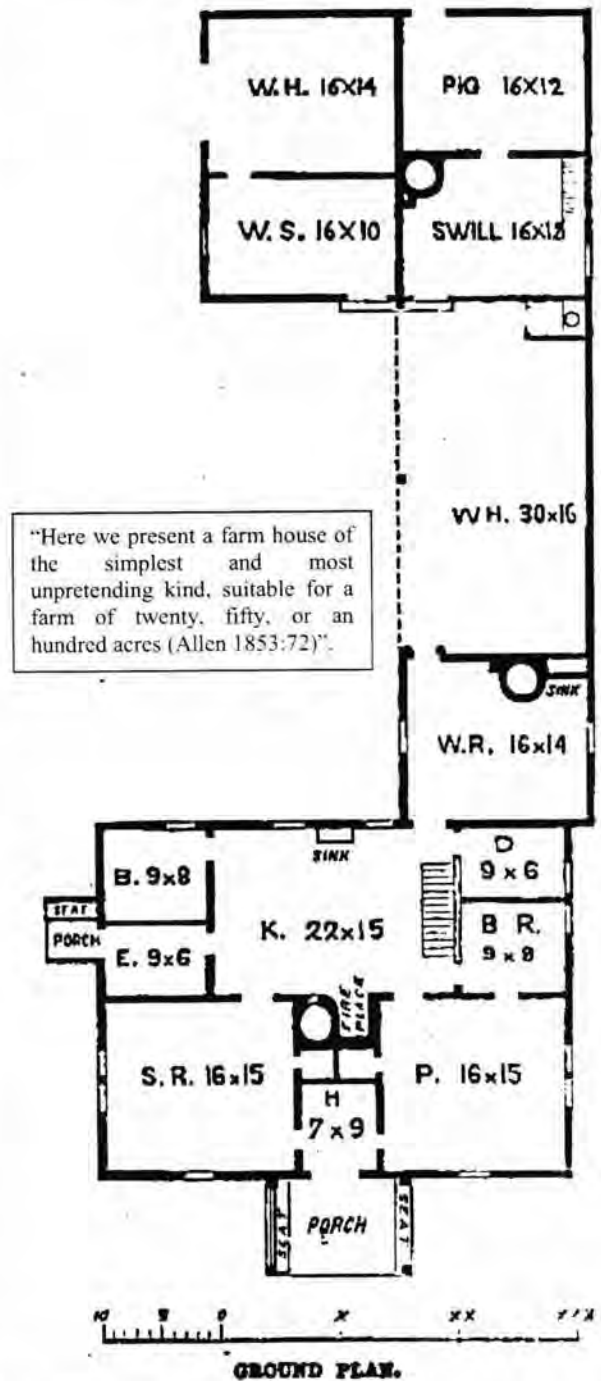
Suggested layout for nineteenth-century farmhouse and outbuildings (Allen 1853).
